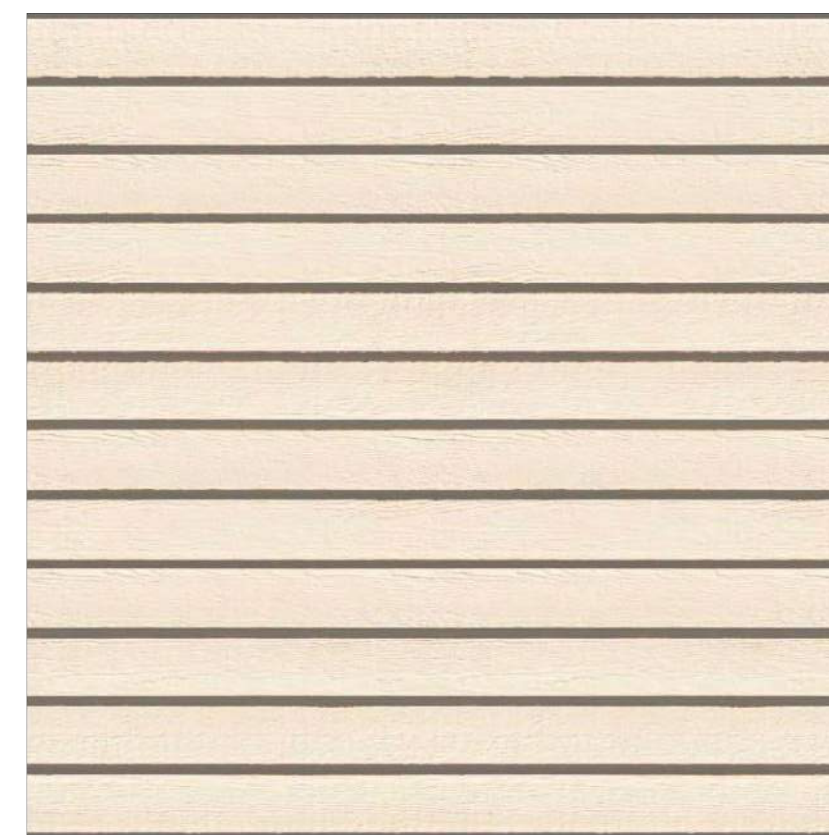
" FIBERCEMENT CLAPBOARD SIDING TO BE INSTALLED AT NEW CONSTRUCTION WHERE NOTED
